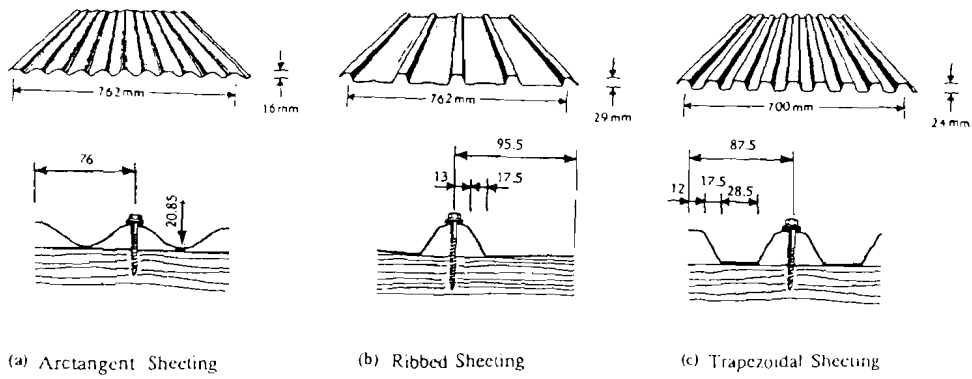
Roofing Sheets and Fasteners Used in Tests [Xu (1995)]
